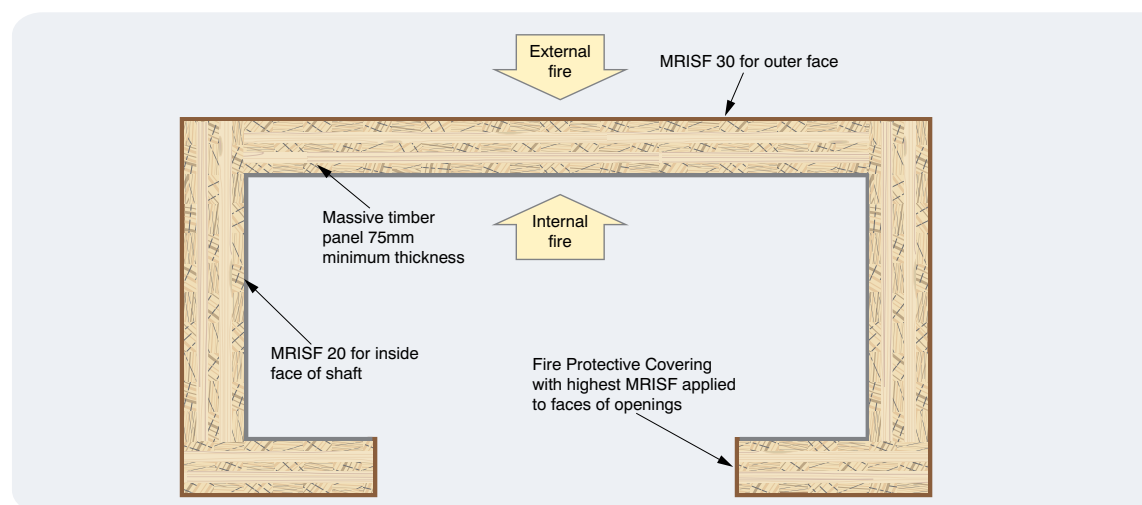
MRISF requirements for typical stair and lift shaft construction for single skin massive timber panel construction.
